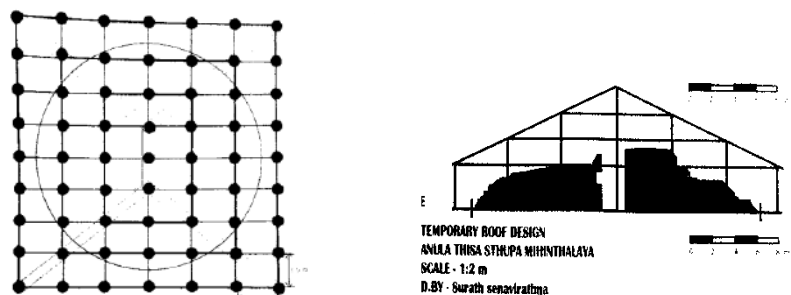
& 11: Plan of Temporary Shelter used in AnulaTisa stupa
